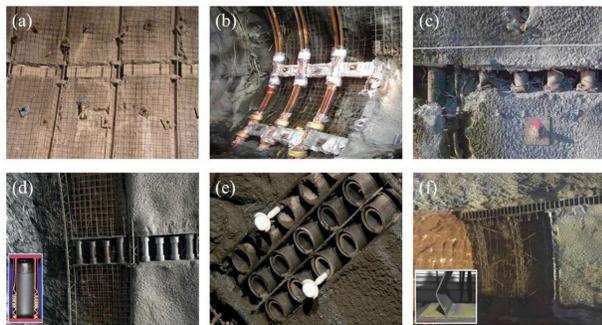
Illustration for applications of yielding elements in tunnels; (a) and (b) porous concrete based element; (c–e) steel pipe-based element; and (f) steel plate-based element. Reproduced with permission from [37]
